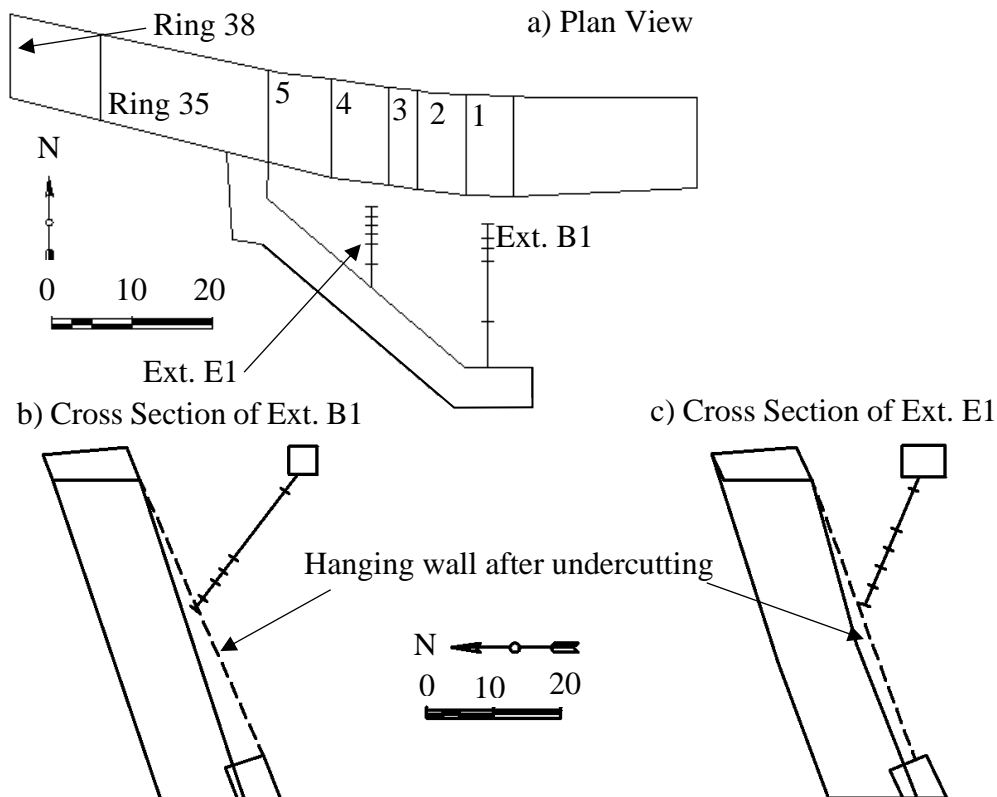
Section views of the Mount Isa 5HP1 stope showing the extensometer location and the stope excavation sequence in (a) plan view, (b) cross section of extensometer B1, and (c) cross section of extensometer E1 (after Milne, 1994).
